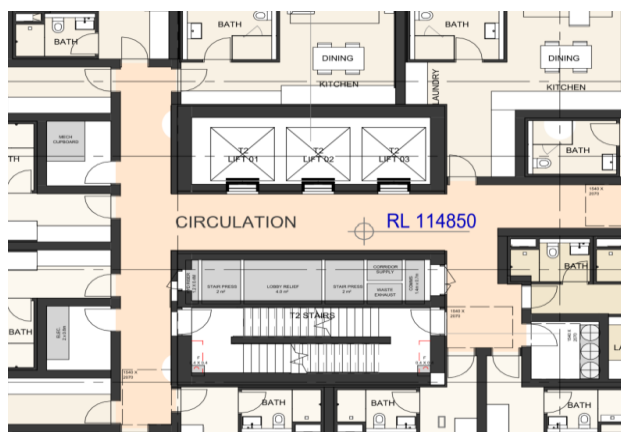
Layout for Level 4-24 of BTR Towers (Source: Woods Bagot)
